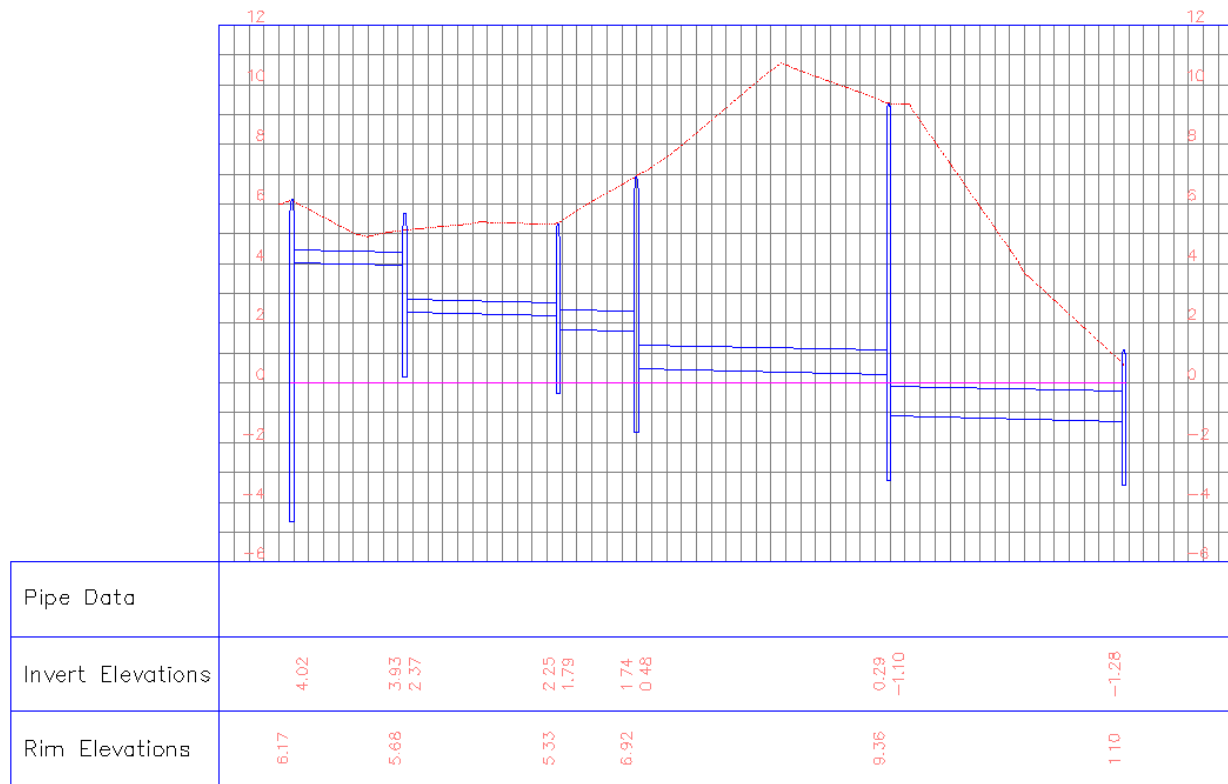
Figure F. Stormwater Pipe Network for Basin H Constructed in Civil 3D Profile
